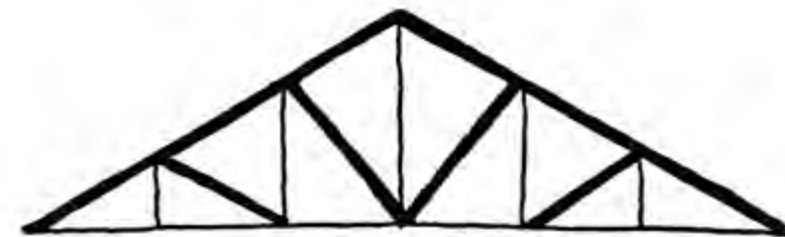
Howe truss, timber, used in smaller constructions of train sheds such as at Crown Street Station.
